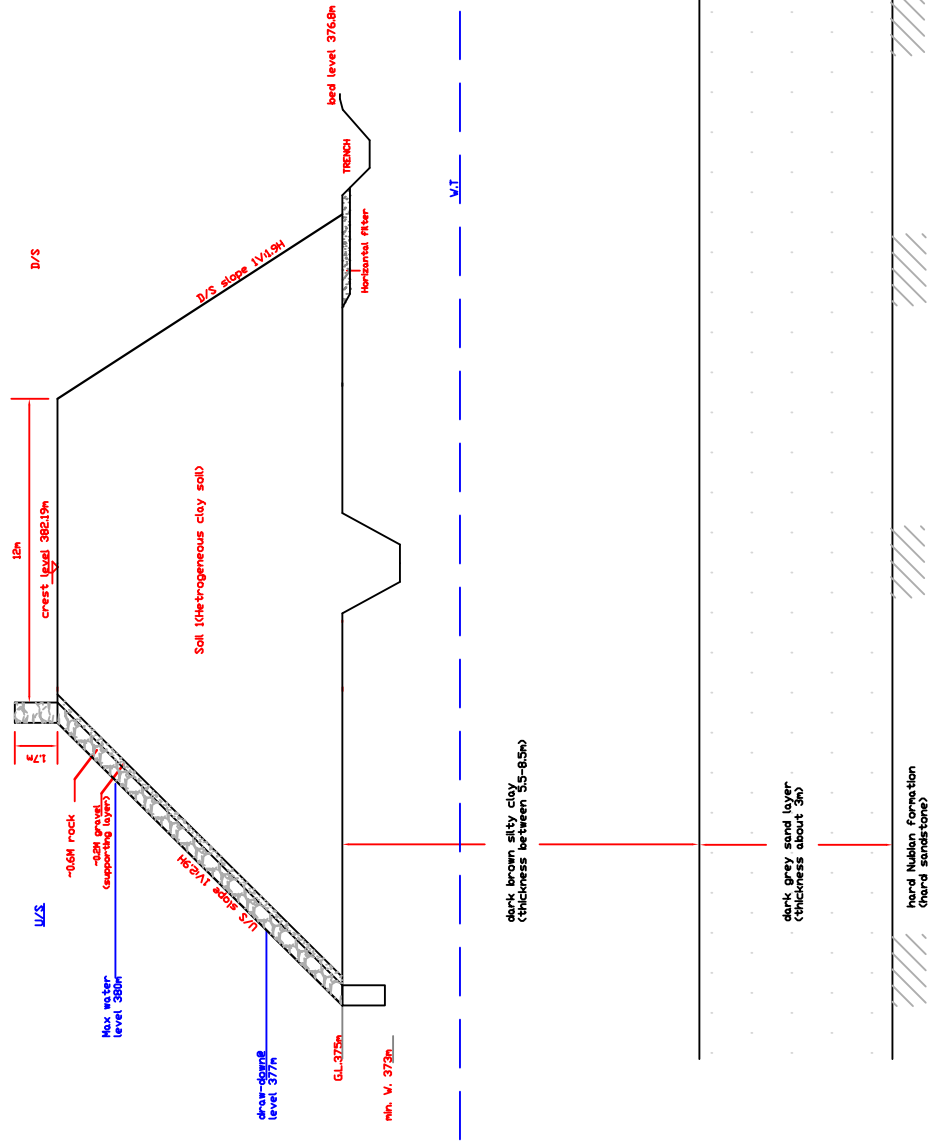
Existing section (dimension and feature) of Embankment and foundation
